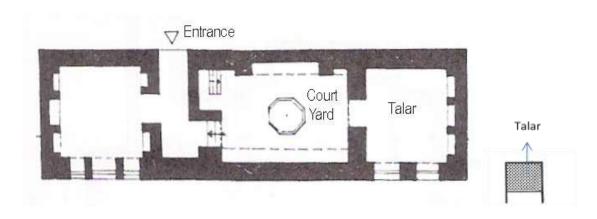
Plan of Talar in Yazd traditional houses(Memarian, 2005)
